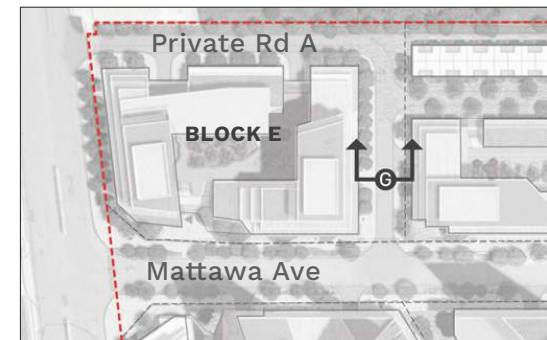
Street Section E (Dundas Street E through North Edge of Site & Block E)
